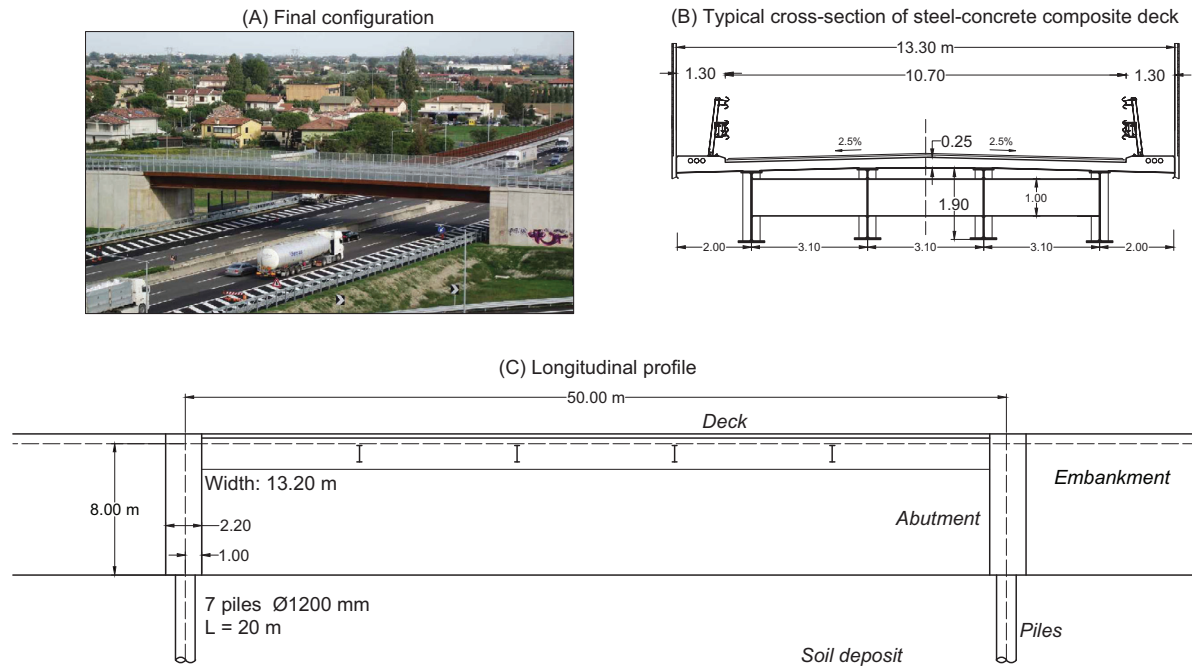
(A) view of the Gatteo highway overpass in service⁴; (B) cross-section of the steel-concrete composite deck of the bridge; (C) longitudinal profile of the structural layout.
